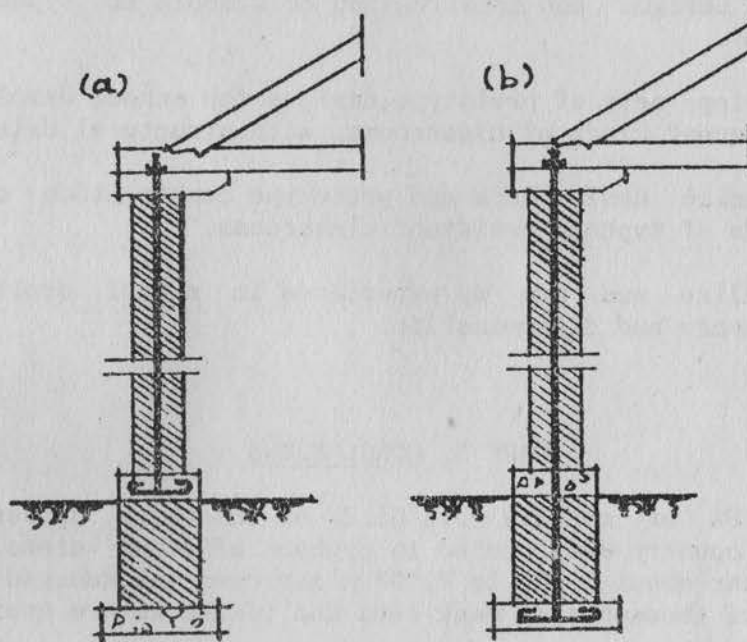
Steel anchor fixed from rafter end to foundation.
